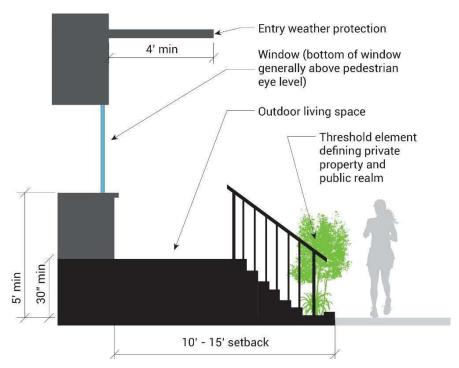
d.i. The above provisions apply to ground-level residential frontages with 10 to 15-foot setbacks. The below provisions apply to ground-level residential frontages with setbacks less than 10 feet.
